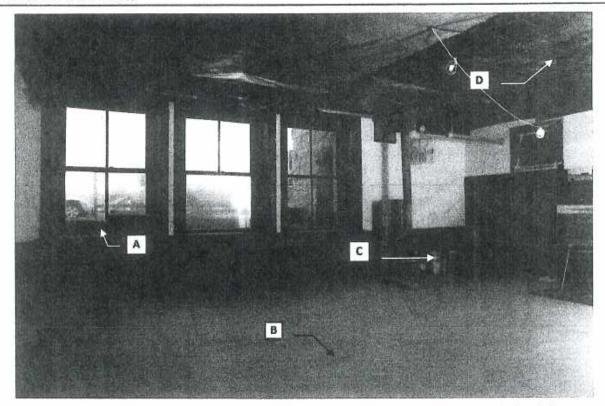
Room 2 view southeast. (A) Fenestration Type 1 – Basement Exterior, (B) Floor is painted white, (C) Nonhistoric wood burning stove, (D) Ceiling is covered with a tarp.
